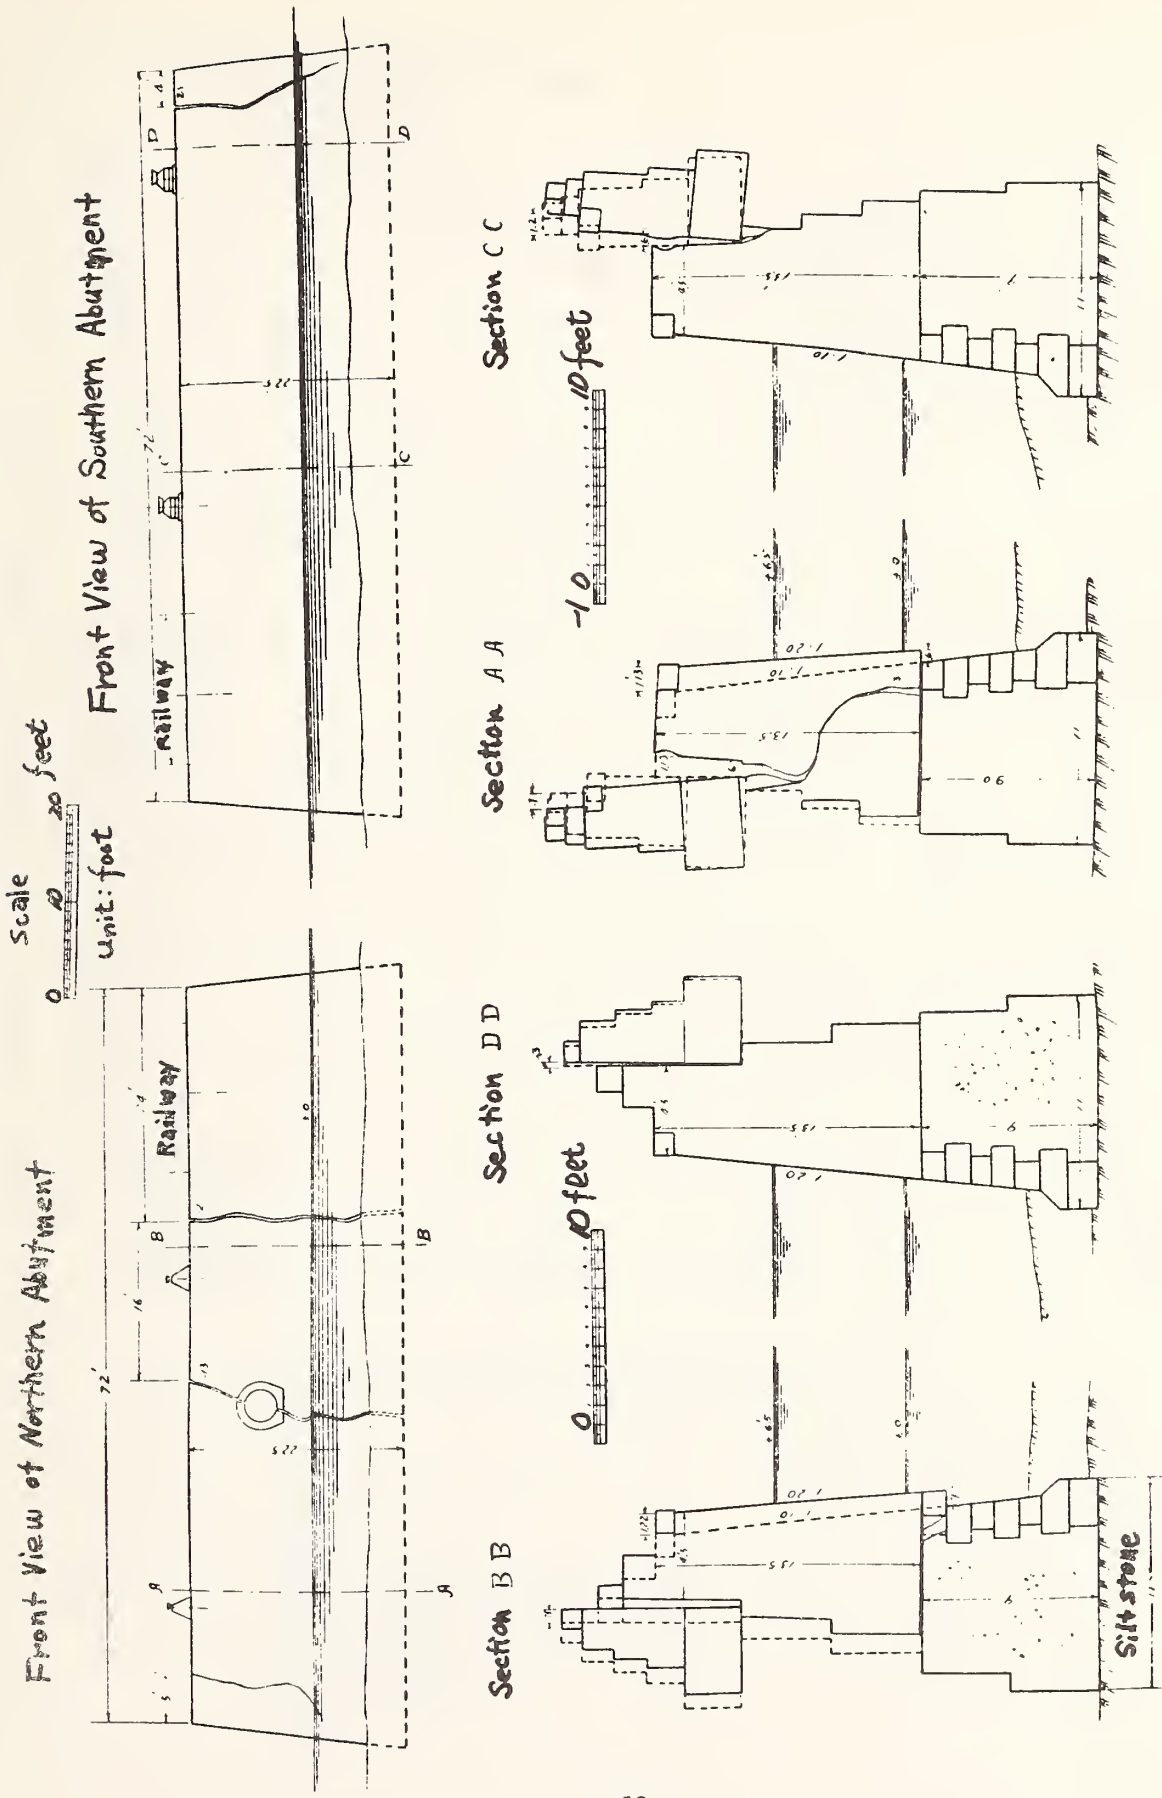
Damage to the abutments of the Shinminato bridge
